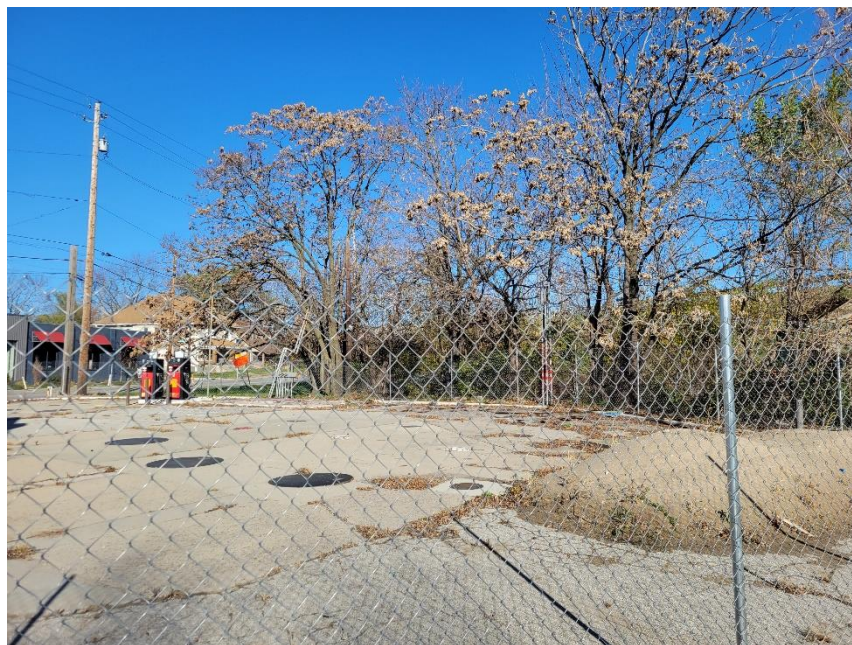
Subject Site from Pleasant Run Pkwy NDR
